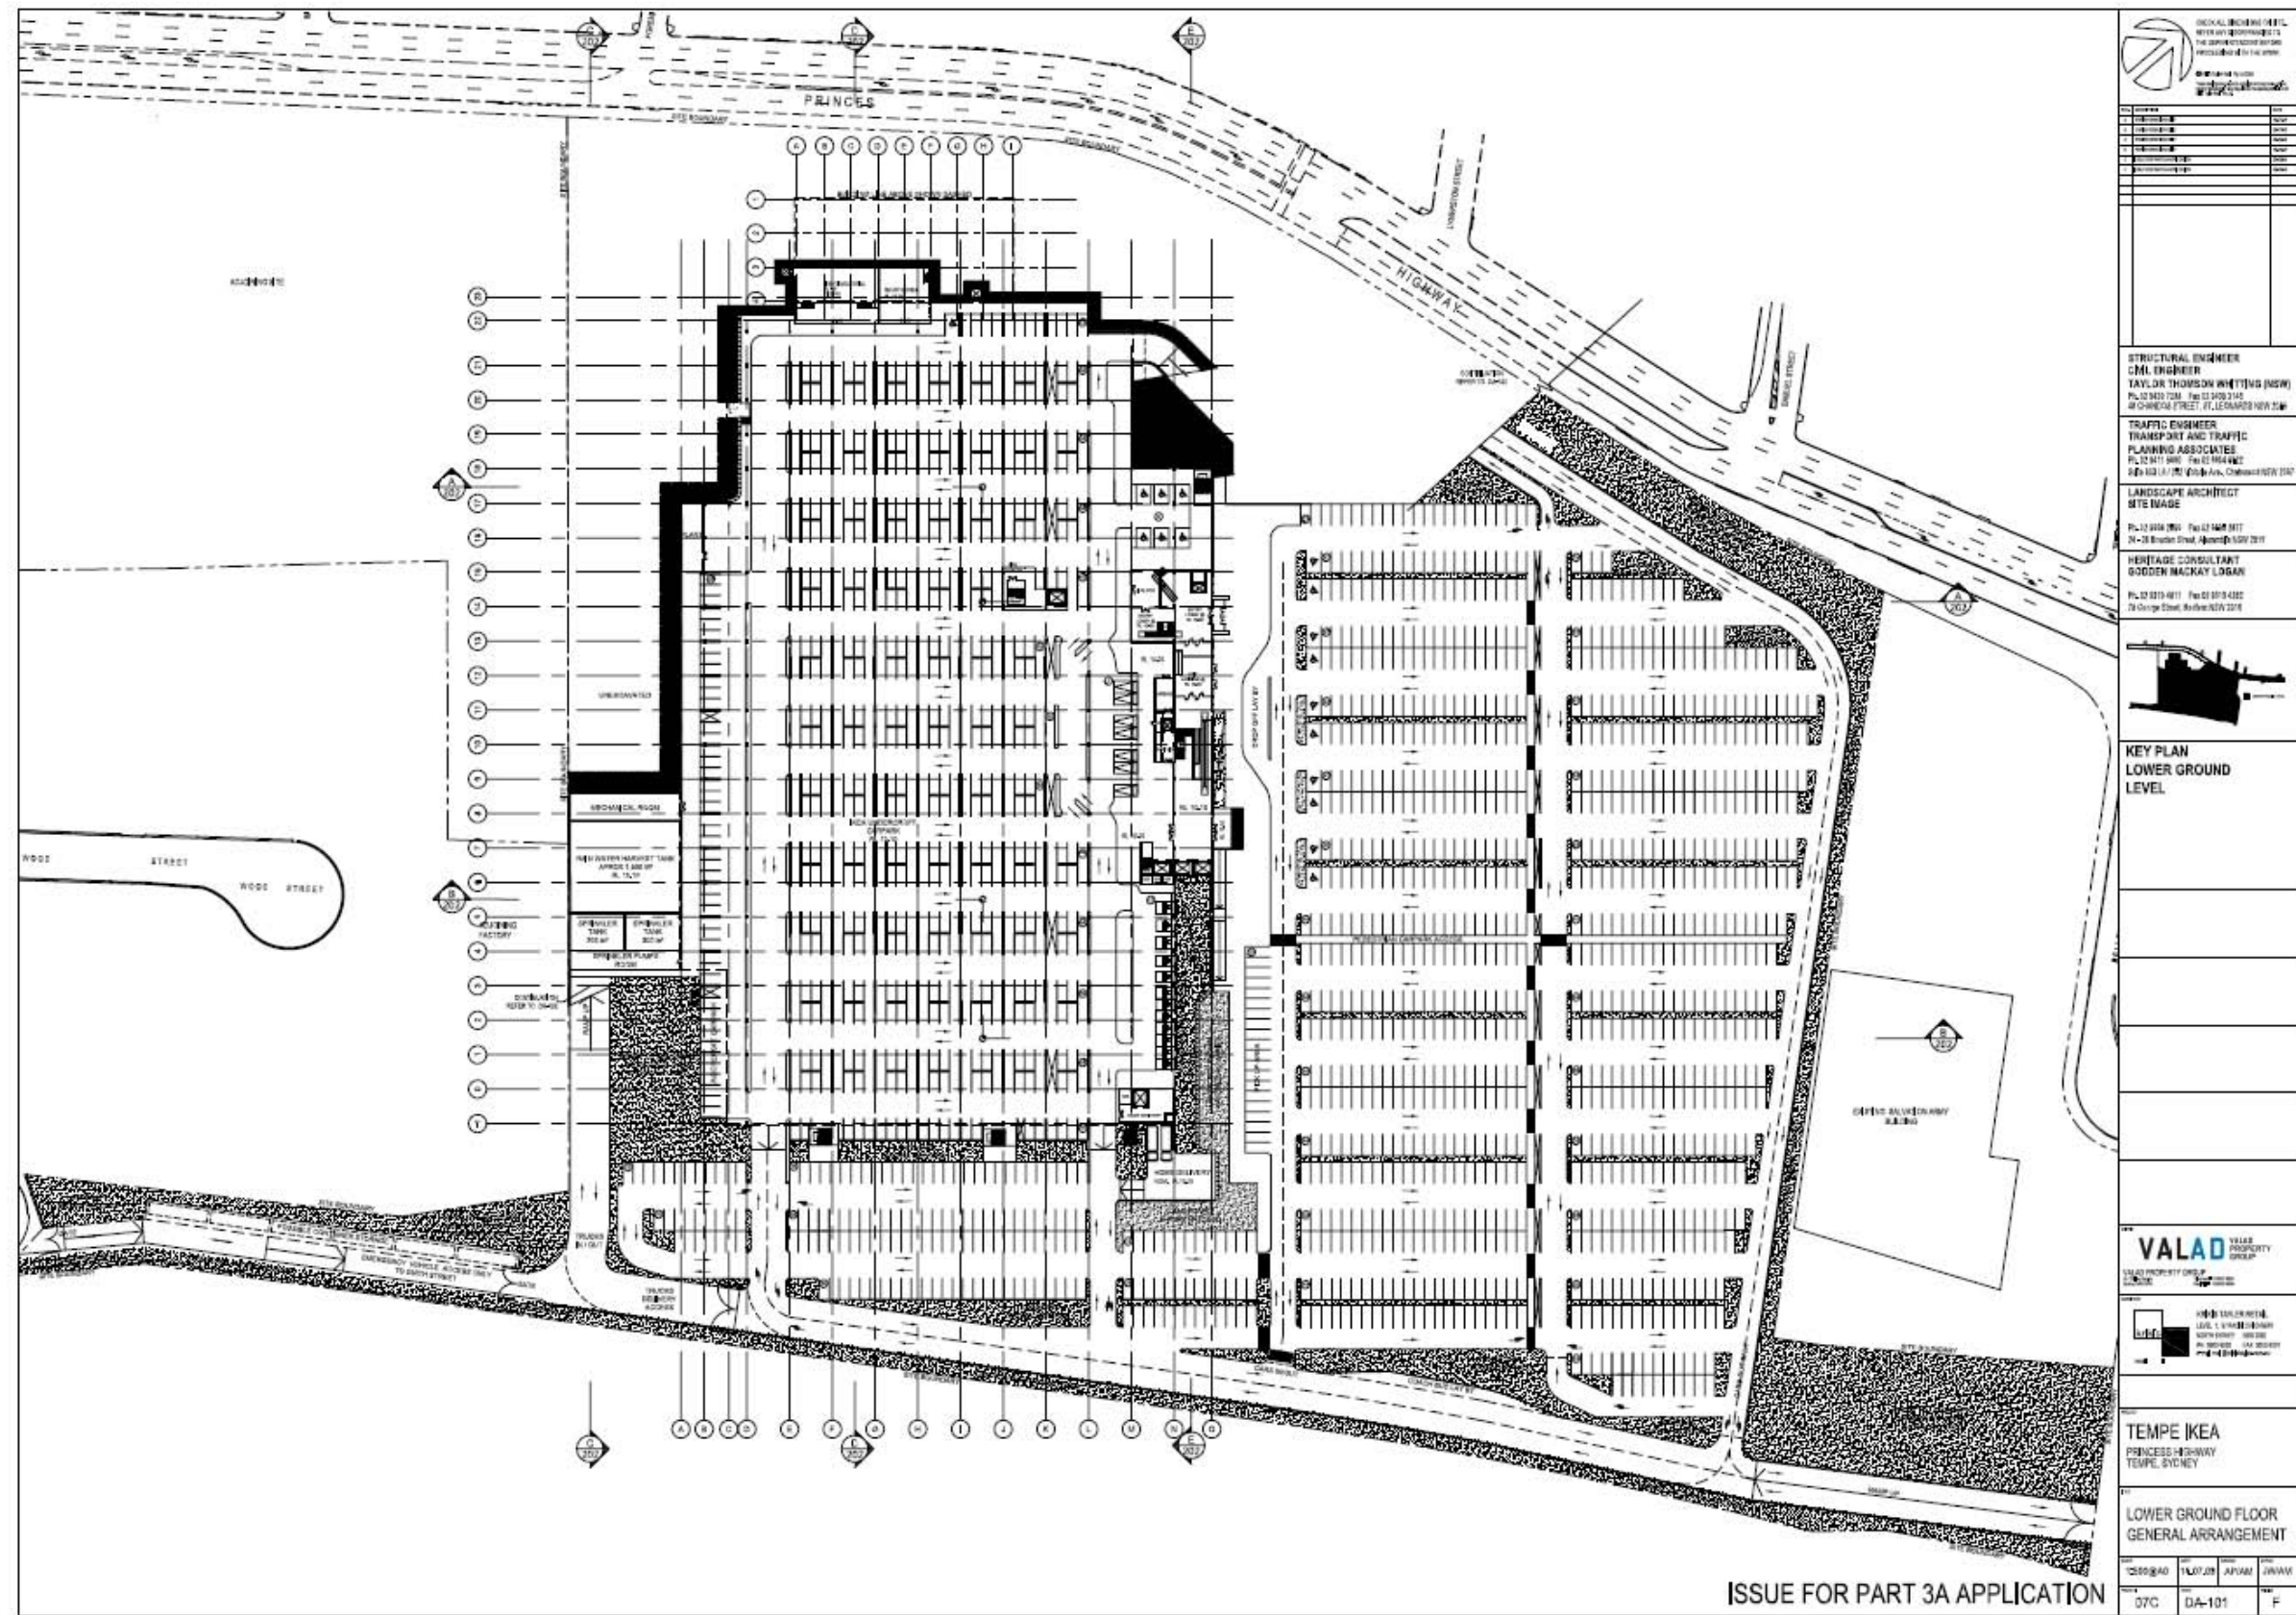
Plan of the lower ground floor arrangement for the new IKEA warehouse and adjacent carpark. (Source: Krikis Tayler)
